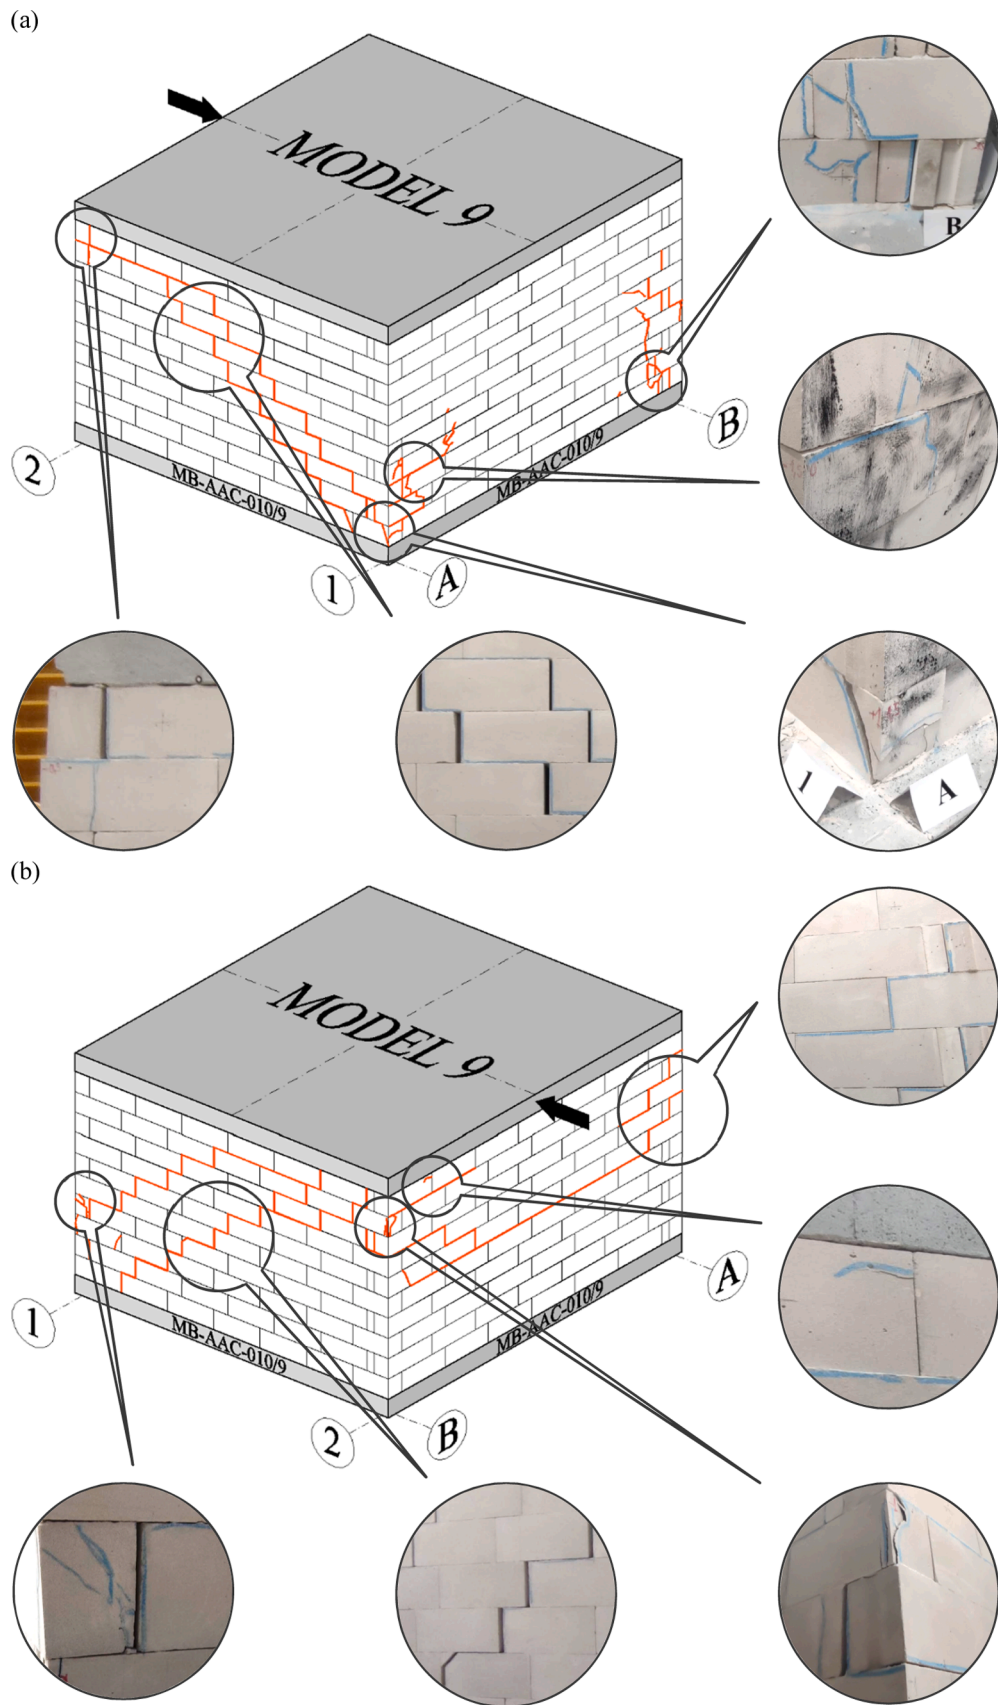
Damage pattern of building model 9: (a) solid stiffening wall A and solid wall 1, (b) solid stiffening wall B and solid wall 2.
